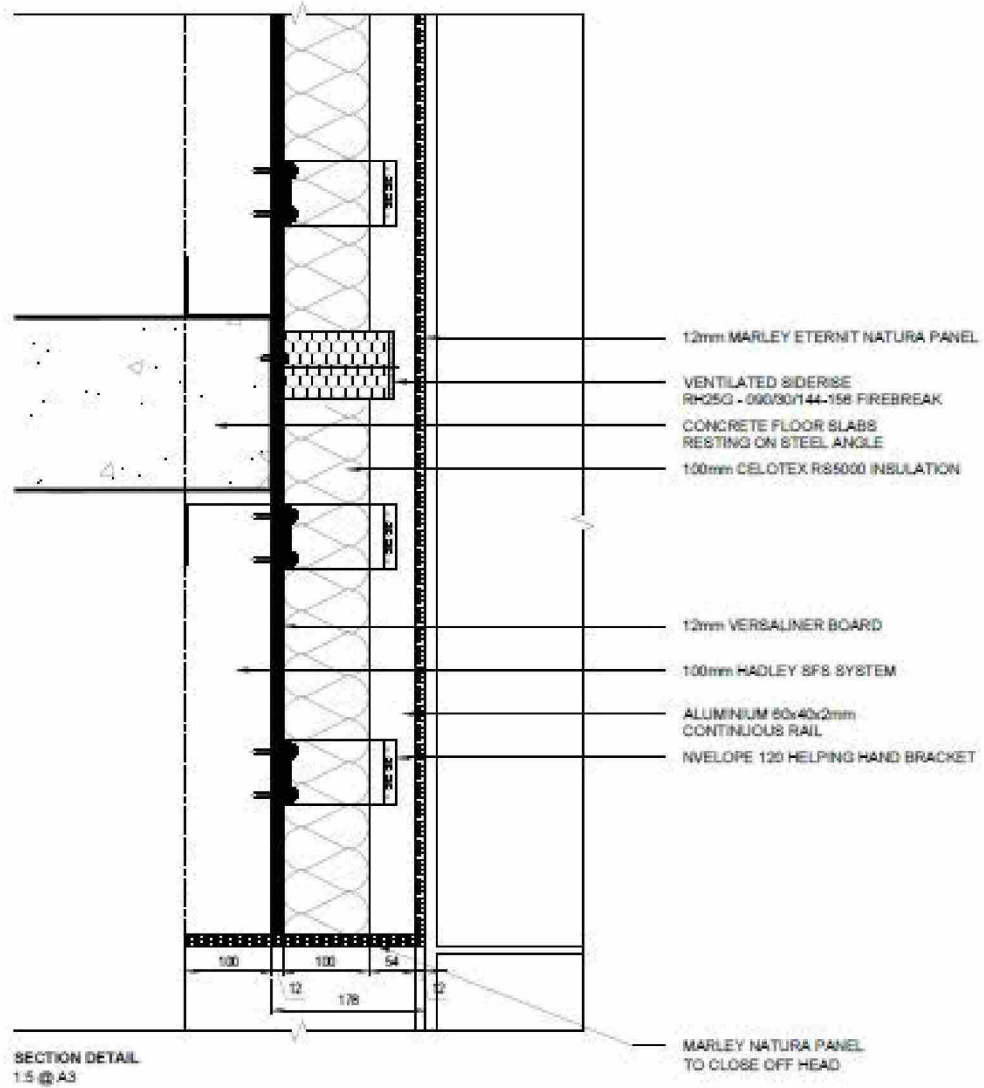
Side view cross-section detailing layers of system (drawing supplied by Test Sponsor).
